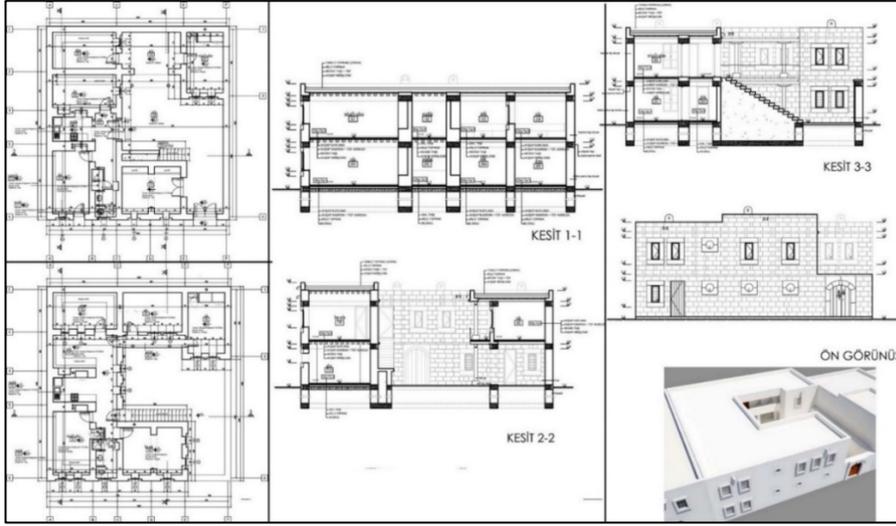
Local texture and architectural features in rural area project type 4C floor plans sections and views (Çorapçıoğlu et al., 2008e).
